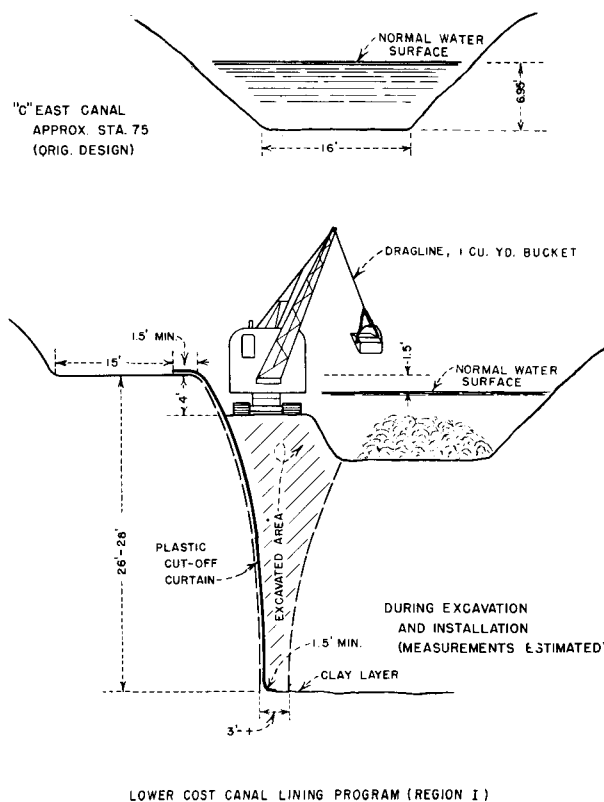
An experimental installation of a plastic cutoff curtain in an excavated trench along a canal of the Boise project, Idaho. 288-D-2679.
